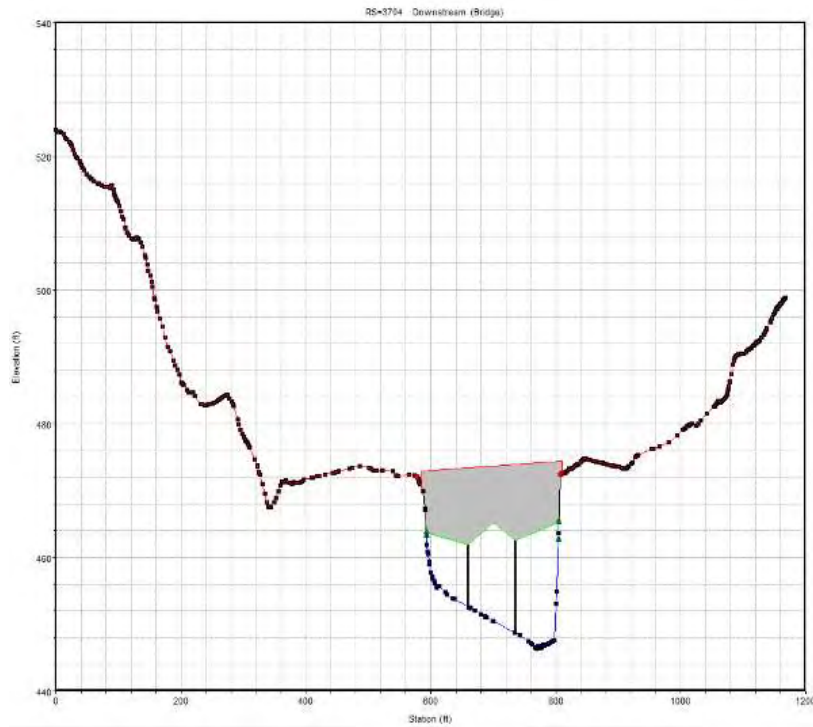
Cross-Section View of the Existing Bridge in HEC-RAS
